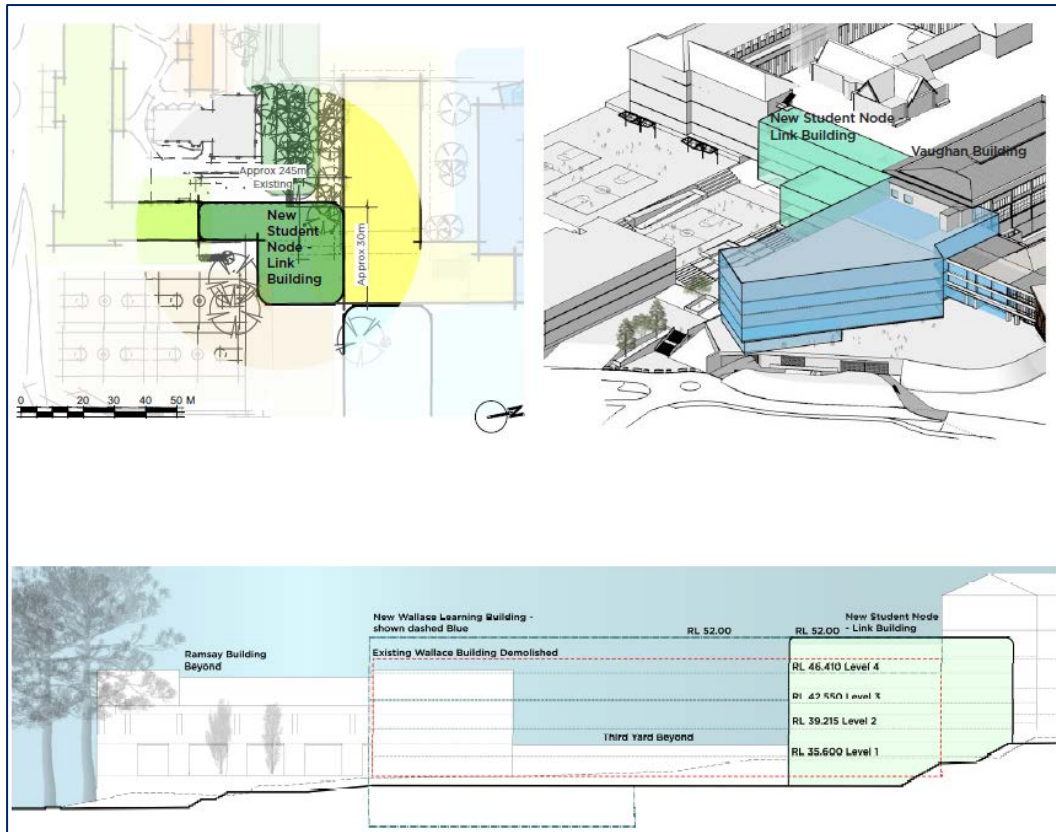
| Cross-section and building mass of new Student Node and Link Building (Source: Amended Modification Report 4 August 2020)
